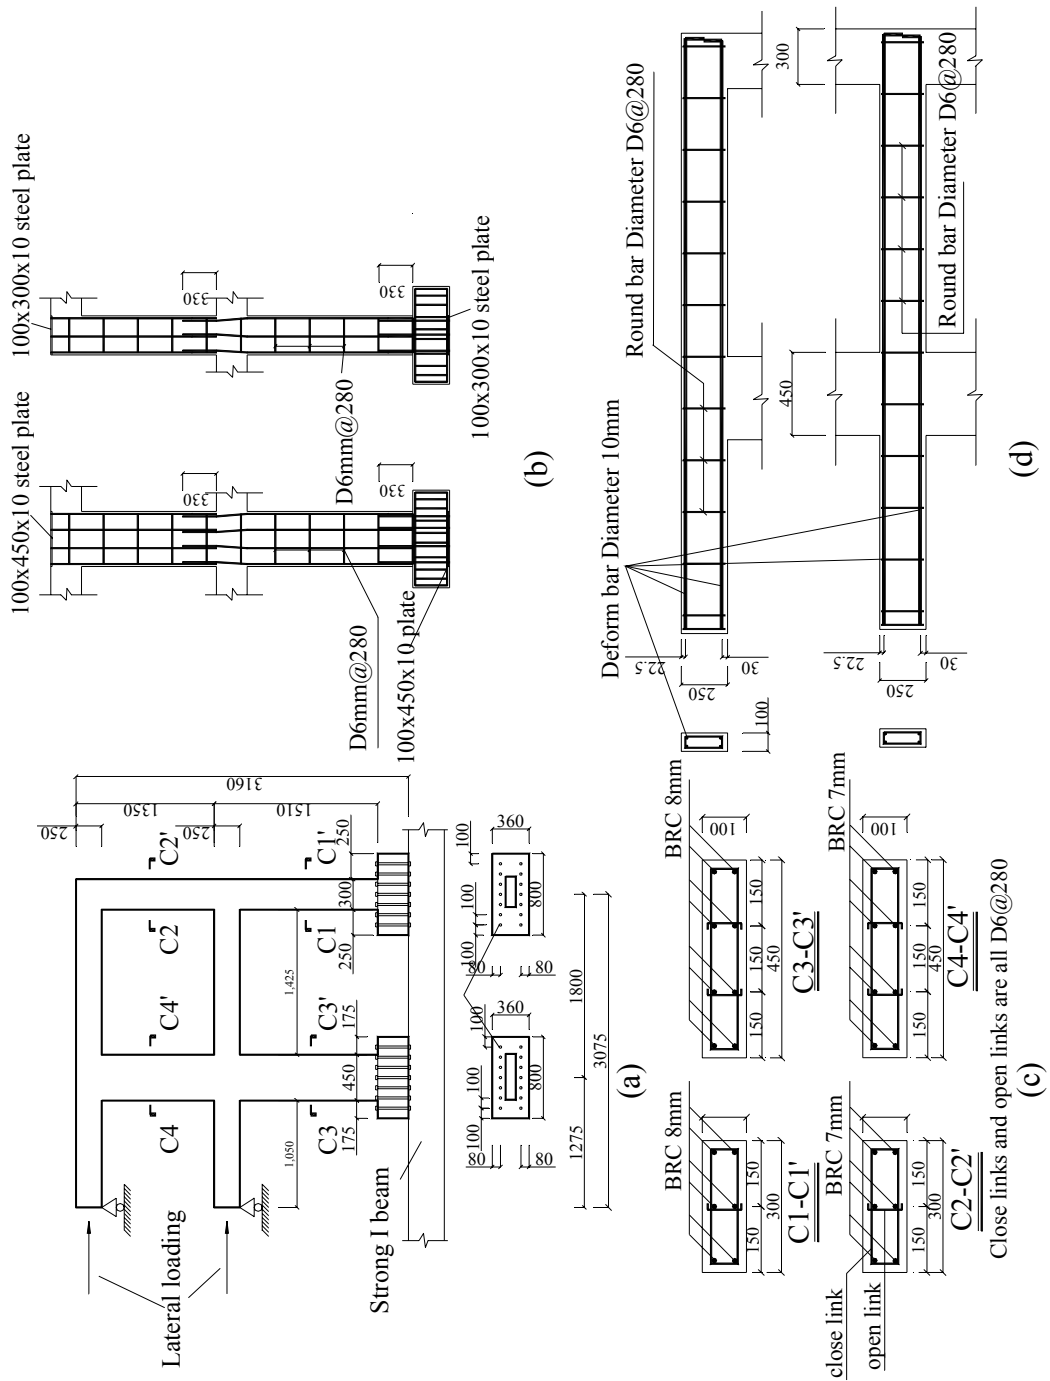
The experimental model: (a) test specimen dimension (b) reinforcement details in columns (c) cross section of columns (d) reinforcement details in beams
